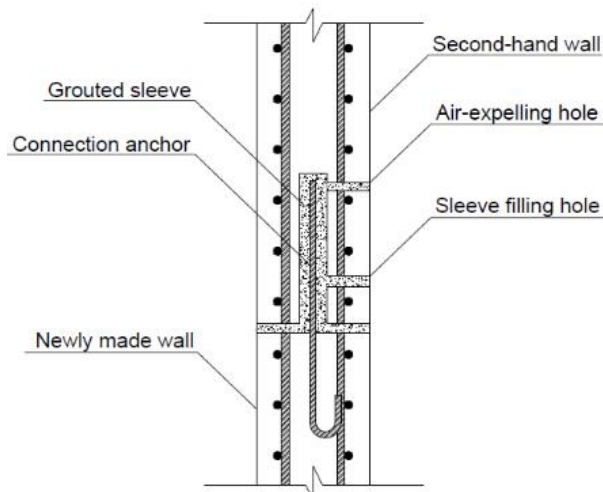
Wall-to-wall connection for reclaimed precast wall elements. (Volkov, 2019)
